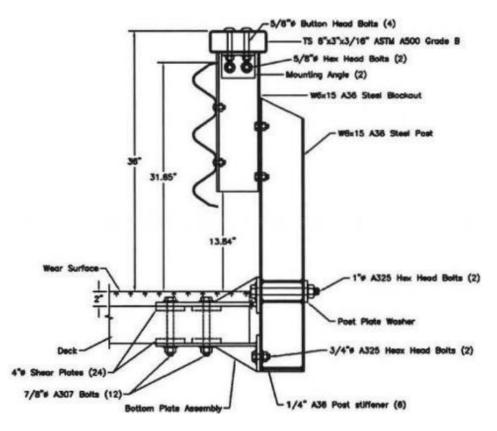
MwRSF STTR Bridge Rail for Transverse, Glulam Timber Decks [18]
